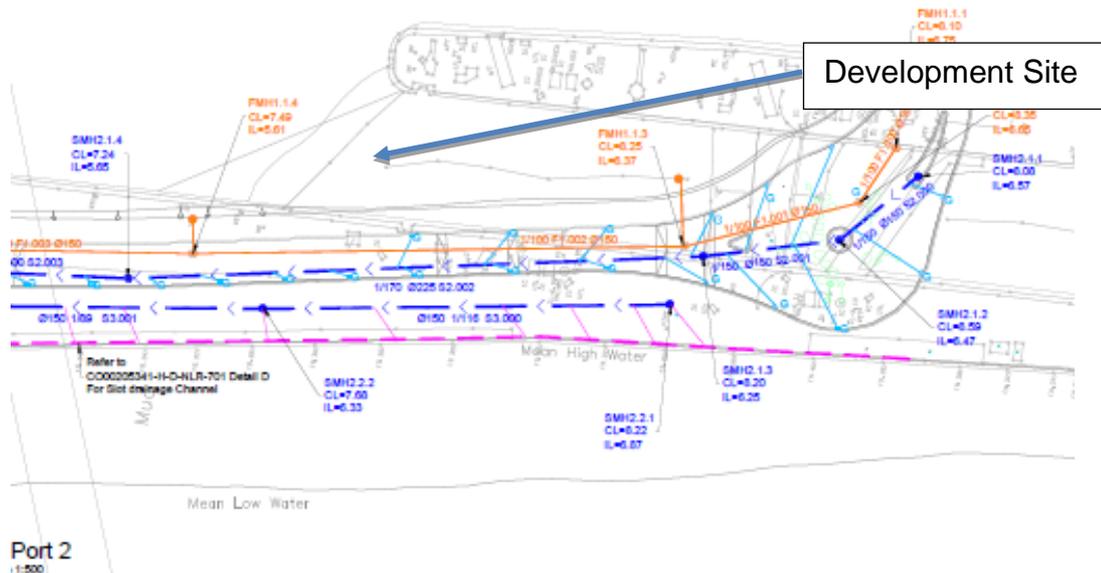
Road Drainage Extract Two (Amey Consulting Drawing CO00205341-H-D-NLR-500)
